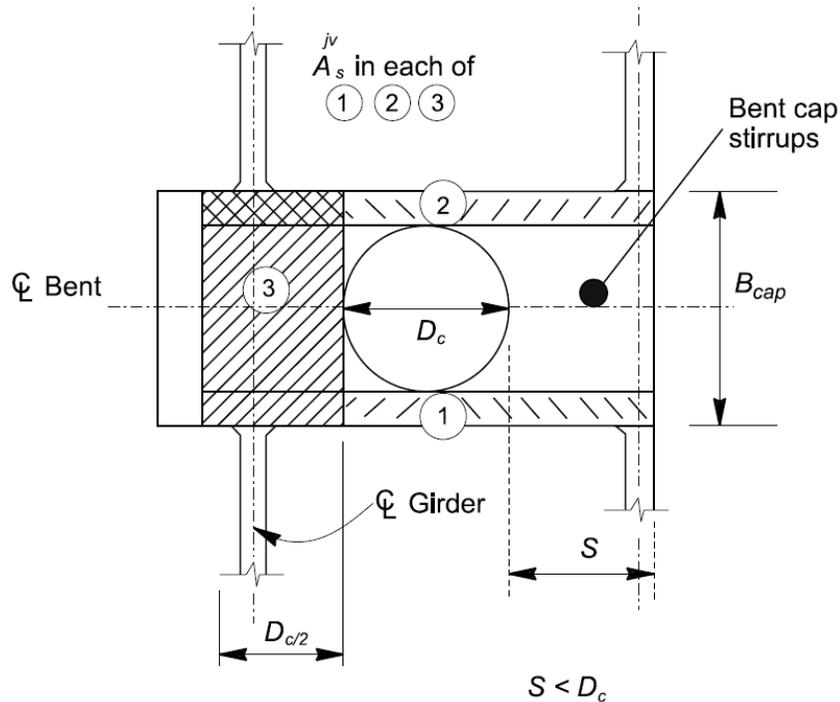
Location of Knee Joint Vertical Shear Reinforcement (Plan View)
